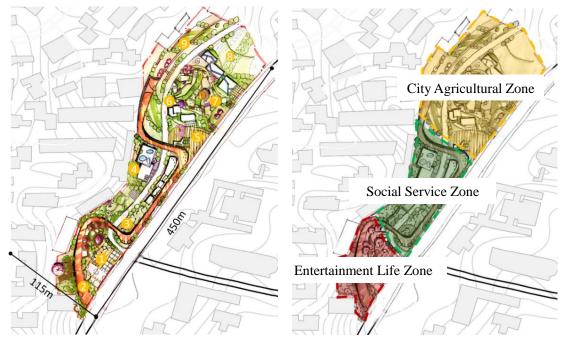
Conceptual design plan of Guohuishan Park
